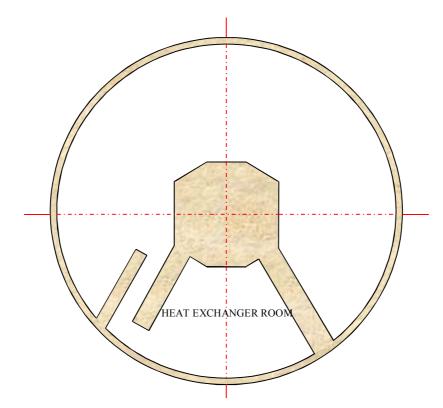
Floor plan of the subterranean processing level of the reactor building.
